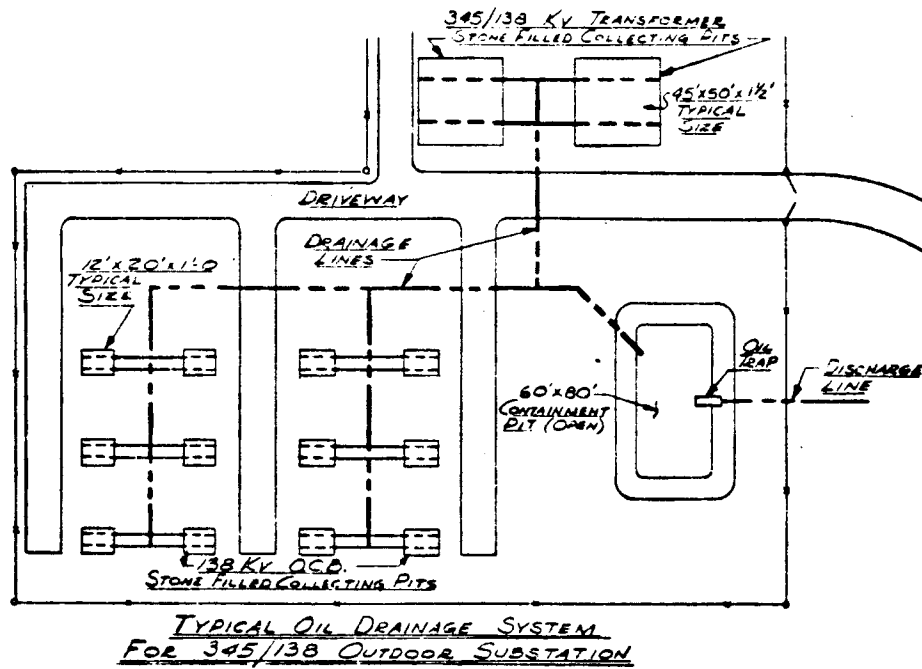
Typical Oil Drainage System for 345/138 kV Outdoor Substation
